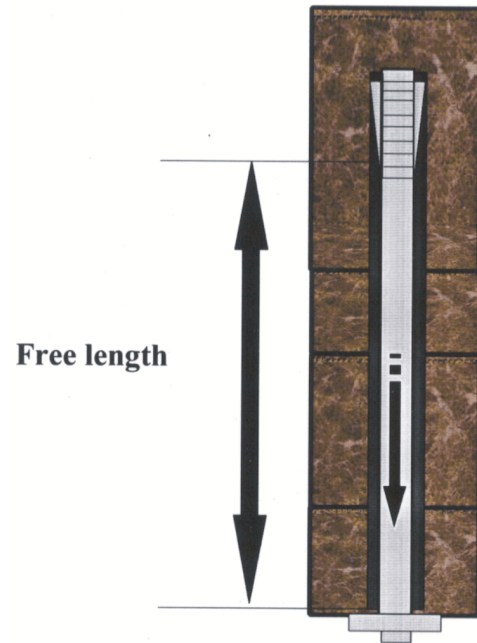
The free length of a point-anchor roof bolt affects its stiffness.
